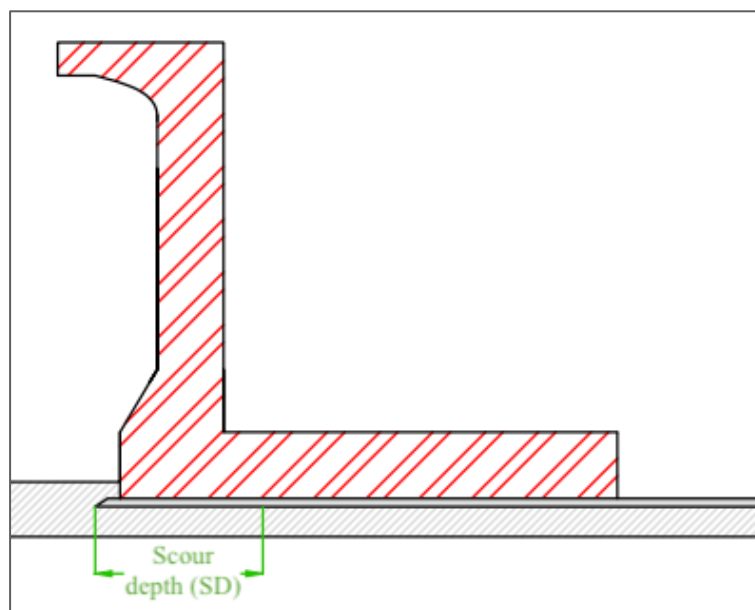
Cross-section of seawall indicating horizontal scour depth (SD)
